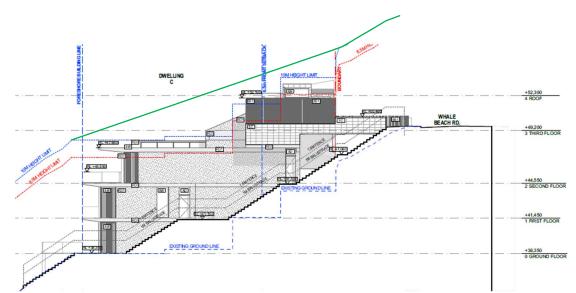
Extract of West Elevation of Dwelling C with 10m height plane to assumed natural ground shown in green Source: Bureau SRH
